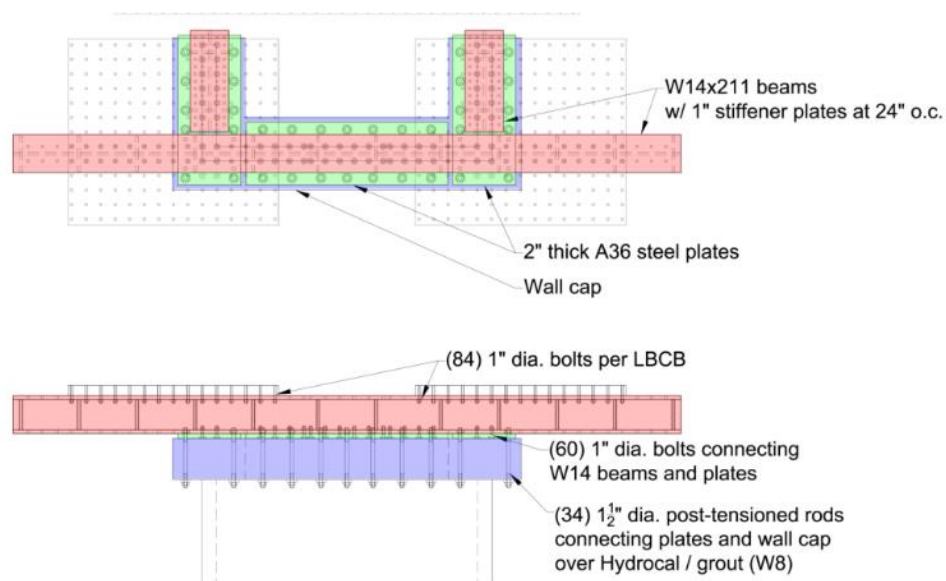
Wall Specimen-to-LBCB Connection Assembly Drawing
